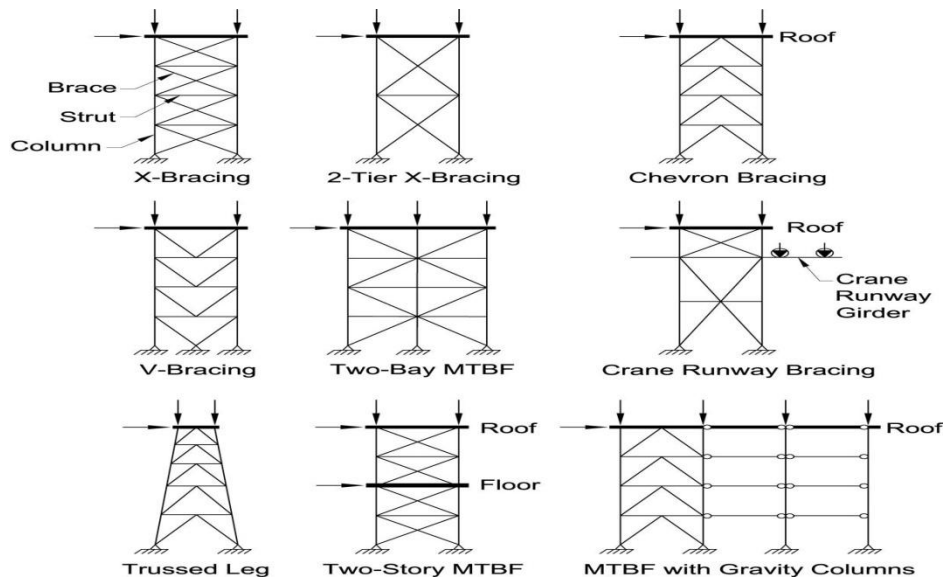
Different Types of Bracing in High-Rise Building Ware House
